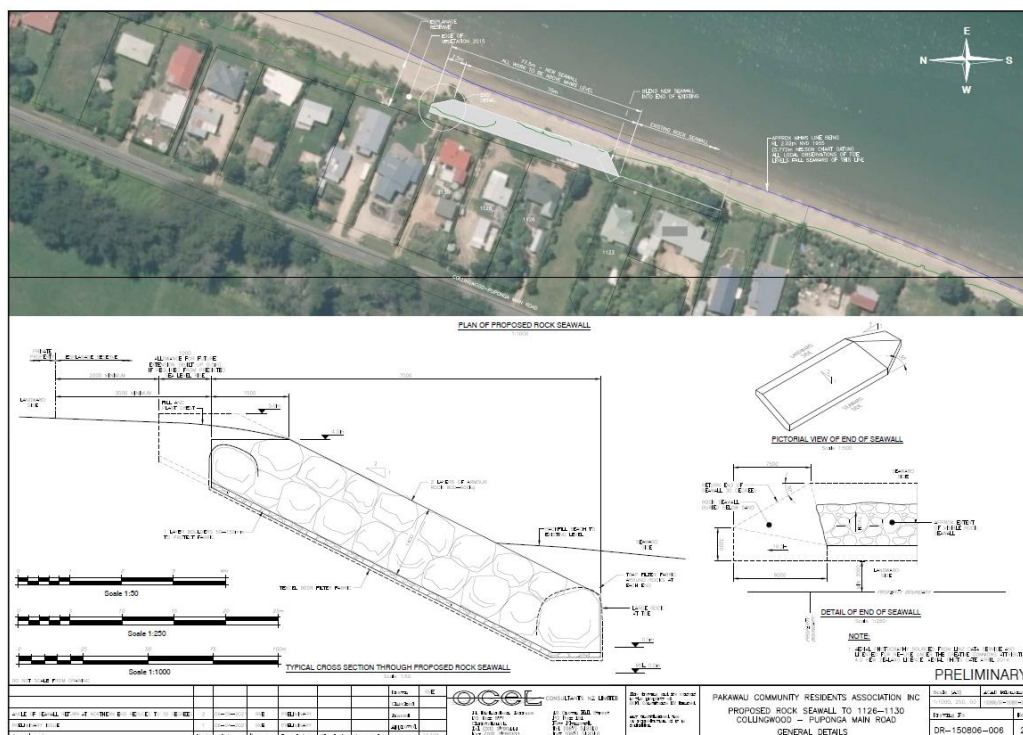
Site Plan and Cross-section Plan of the proposed Rock Revetment Structure. A pdf copy of the site plan is appended to this application as Appendix 3.
